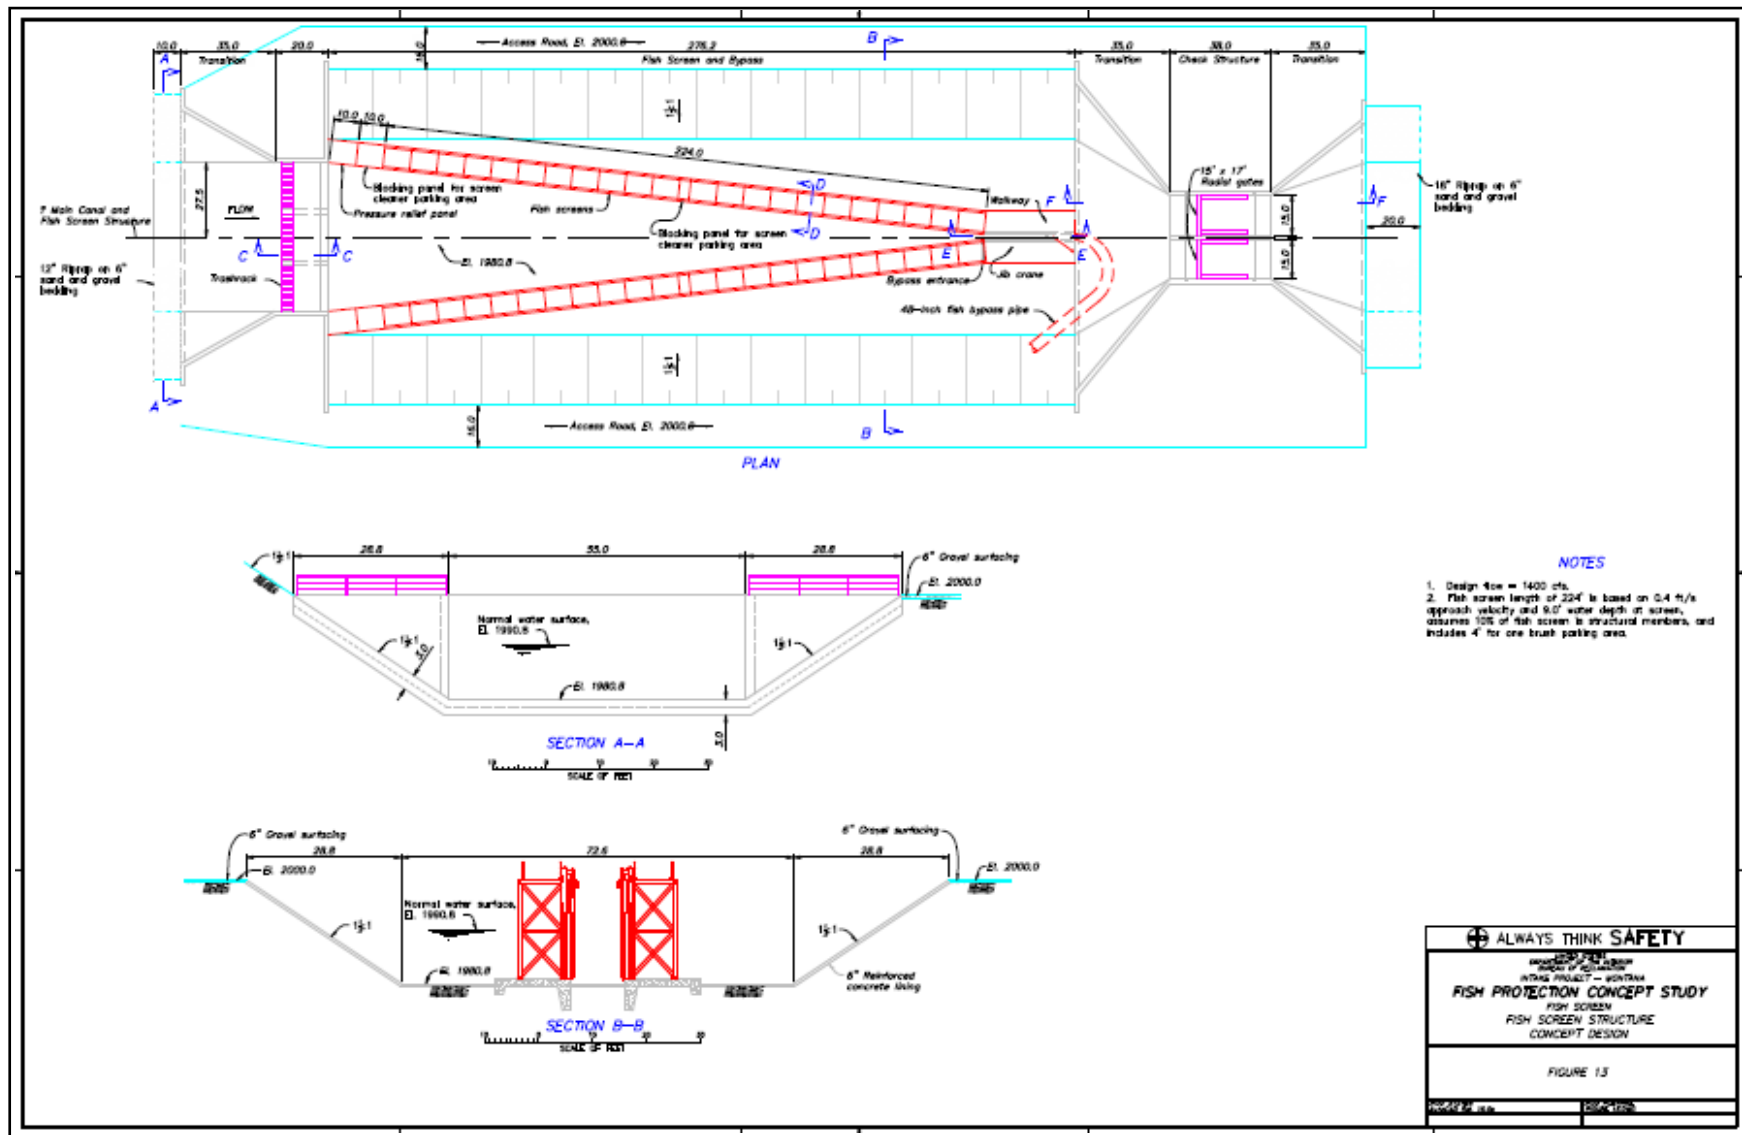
Fish Screen Structure Detail Plan and Cross Sections
